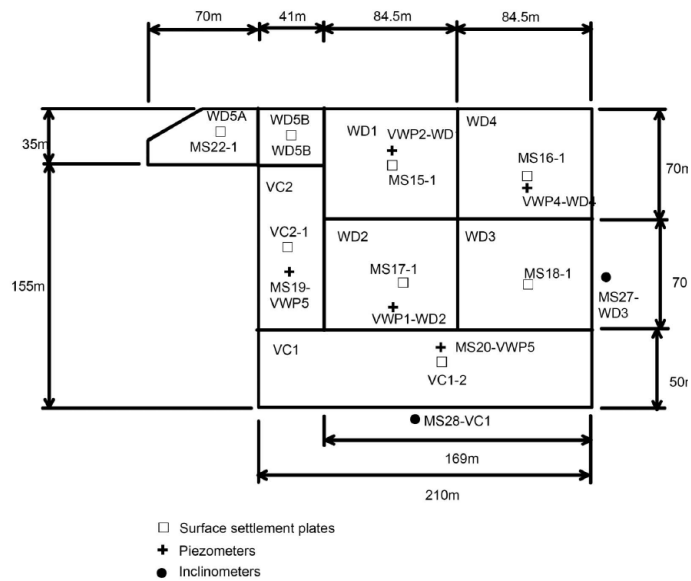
S3A Trial Area – Layout and detail design specifications (Indraratna et al., 2011, with permission from ASCE).
